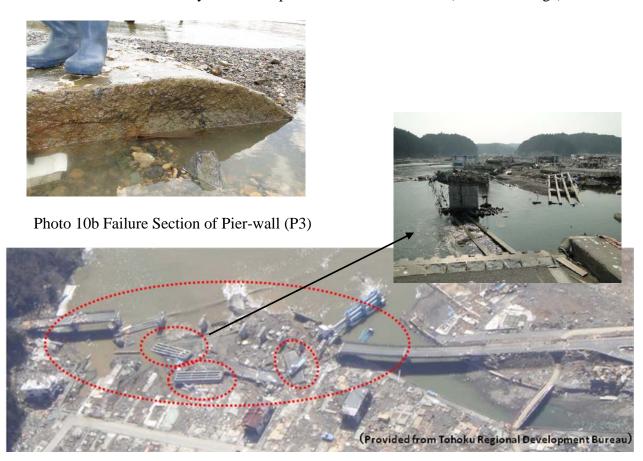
Washed Away of PC Superstructure (Utatsu Ohashi Bridge)
